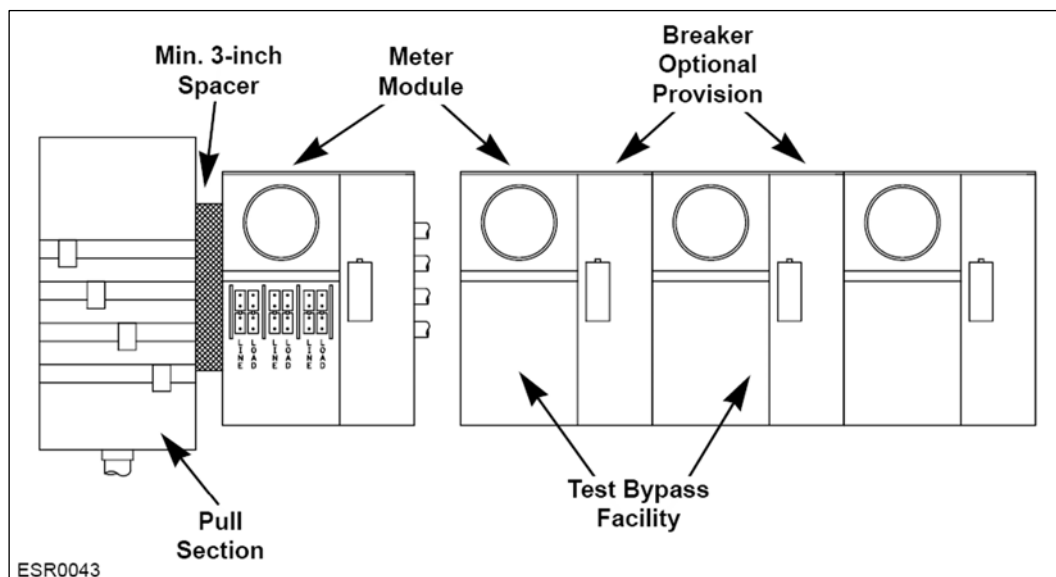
Commercial Module Meter Sockets (EUSERC 304, 305, 347)
